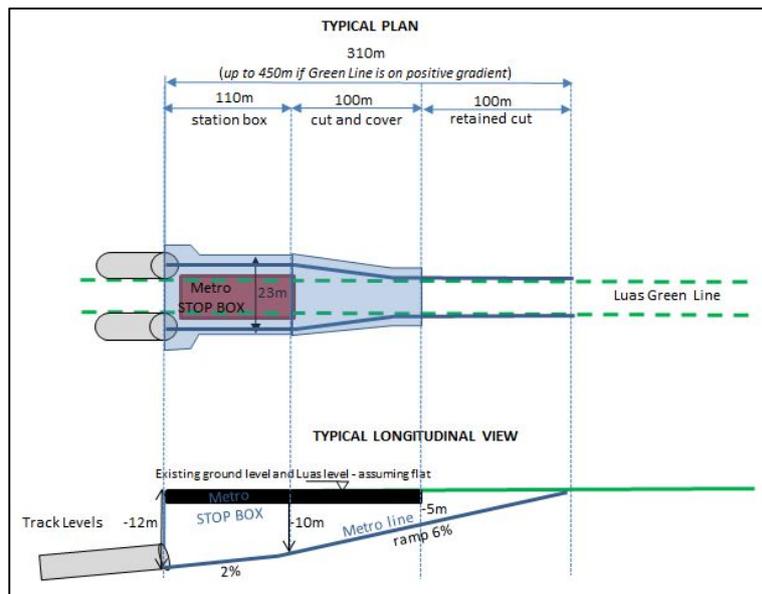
Typical plan and vertical section of in-line tie-in with underground stop box
